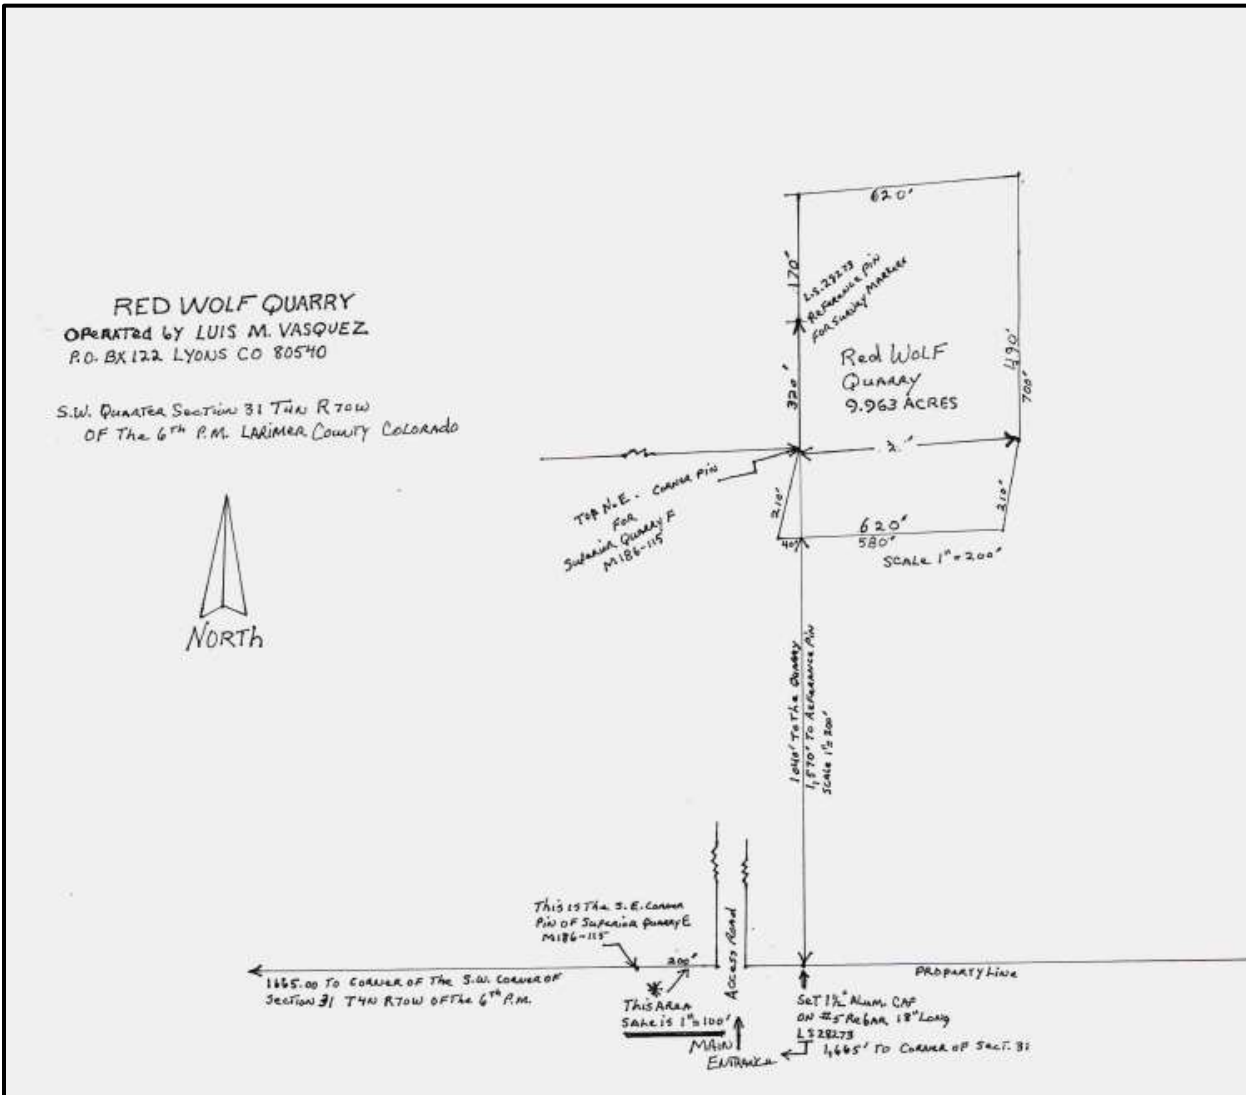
Permit Site Plan from Red Wolf Quarry Permit Application
